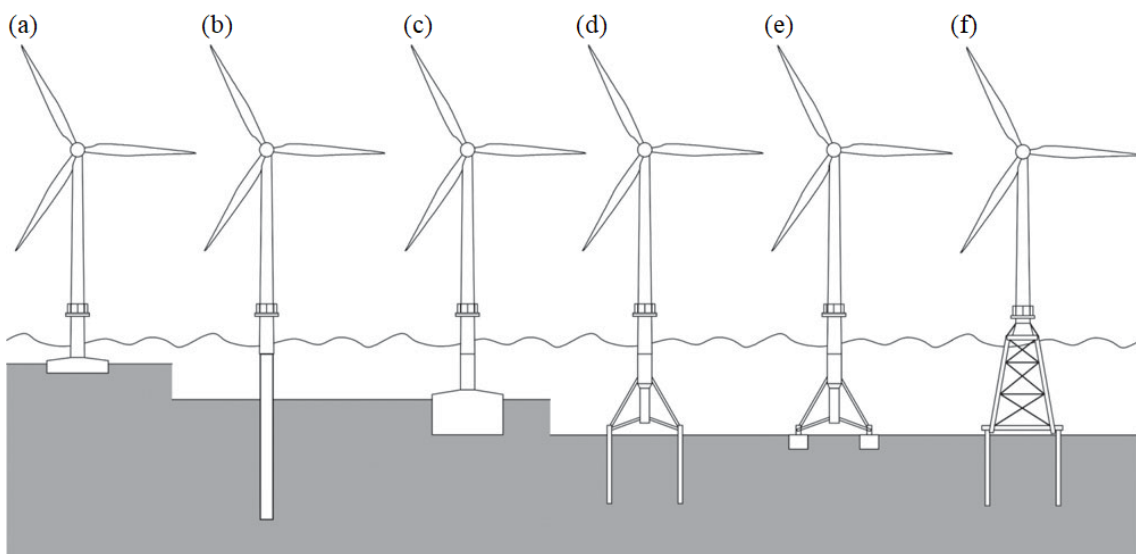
Common foundation types for bottom-mounted OWTs. a) Gravity based foundation, b) Monopile foundation c) Caisson foundation, d) Multipile foundation, e) Multi caisson foundation and f) Jacket foundation (Kallehave et al. 2015).
